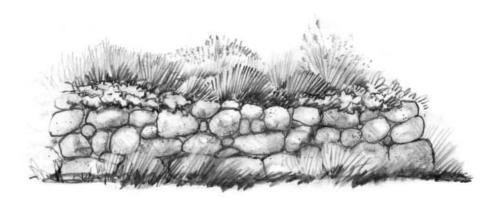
Retaining Wall Finishes - Stacked Wall
